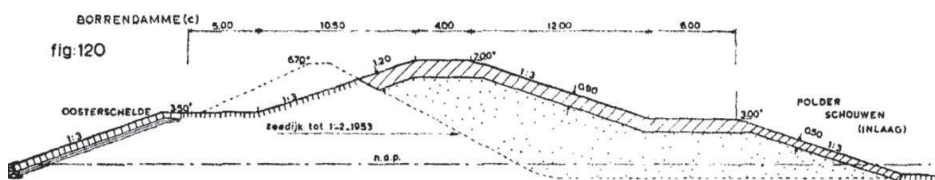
Typical cross section, source: Wilderom, 1964, pp 273
